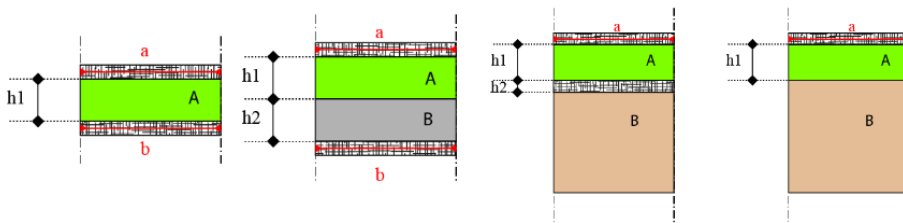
, Examples of one-dimensional computation geometries: slab, slab on pre-casted concrete, slab on ground with and without insulation in between.
